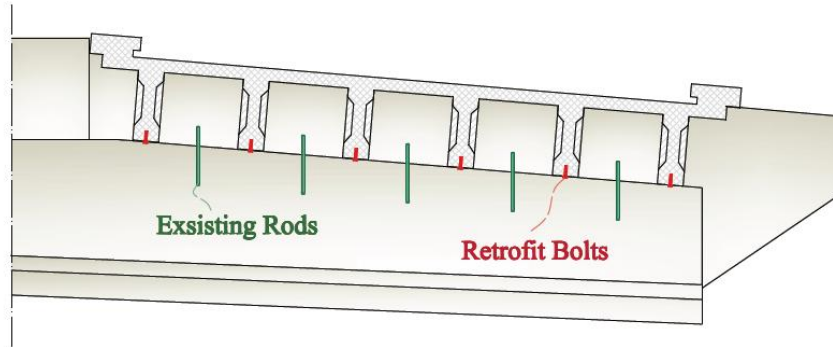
Frontal view of the West abutment of No 1 Bridge.
